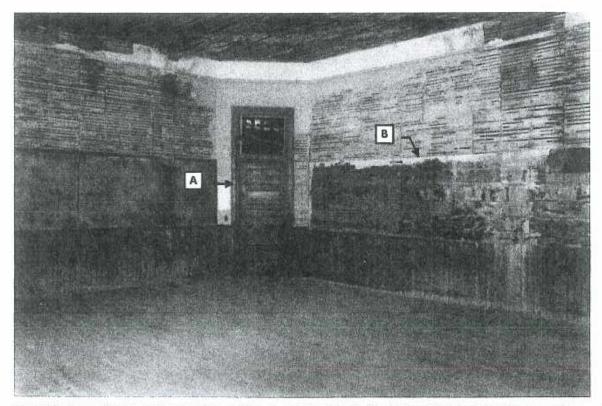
Room 16 view southwest. (A) Door Type 3 - Interior Hinged. (B) Blackboard and case molding are missing.
